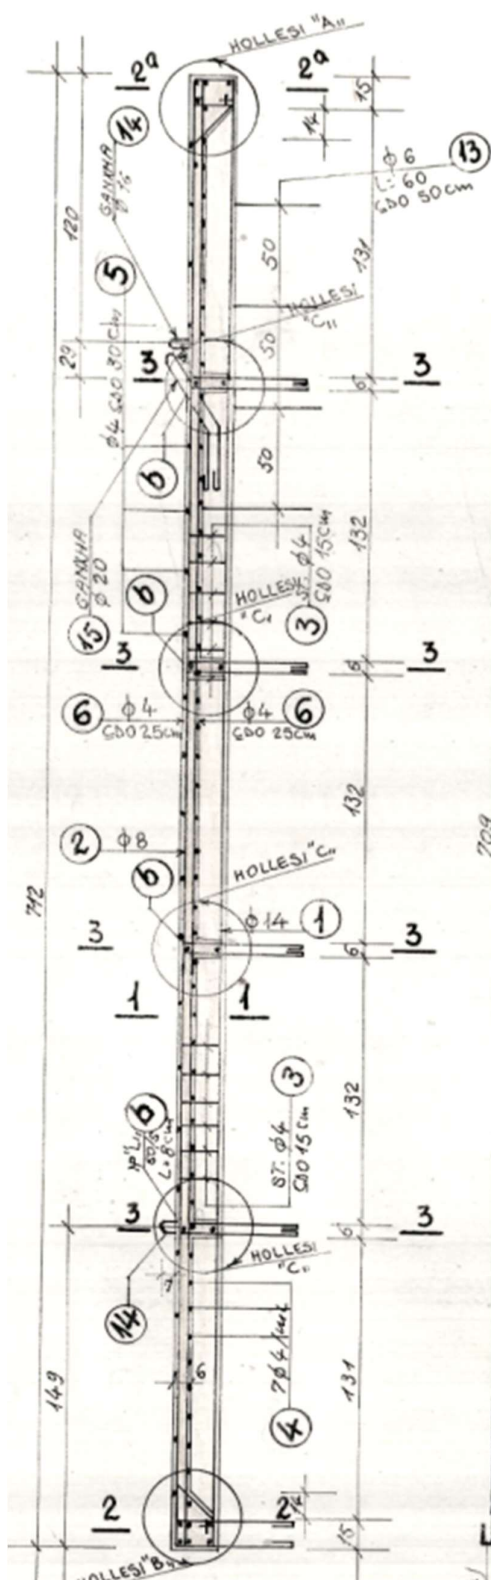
View of the reinforced steel on the panel, beam and the steel braces of the supporting beam
